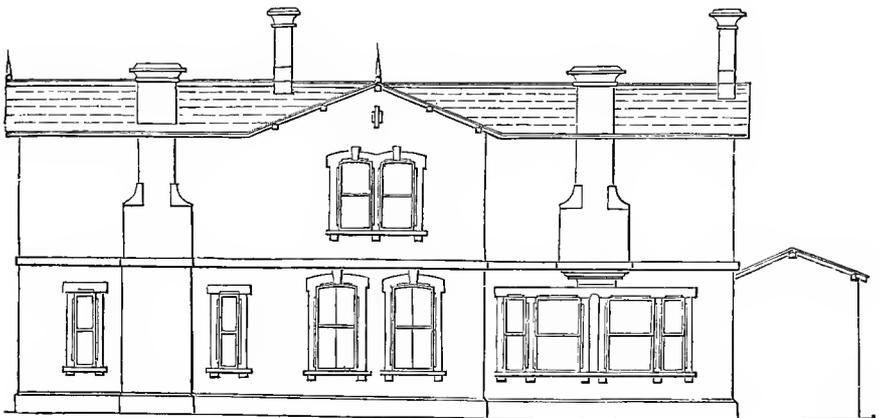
Back elevation of alternative design—scale in Plate VIII.
